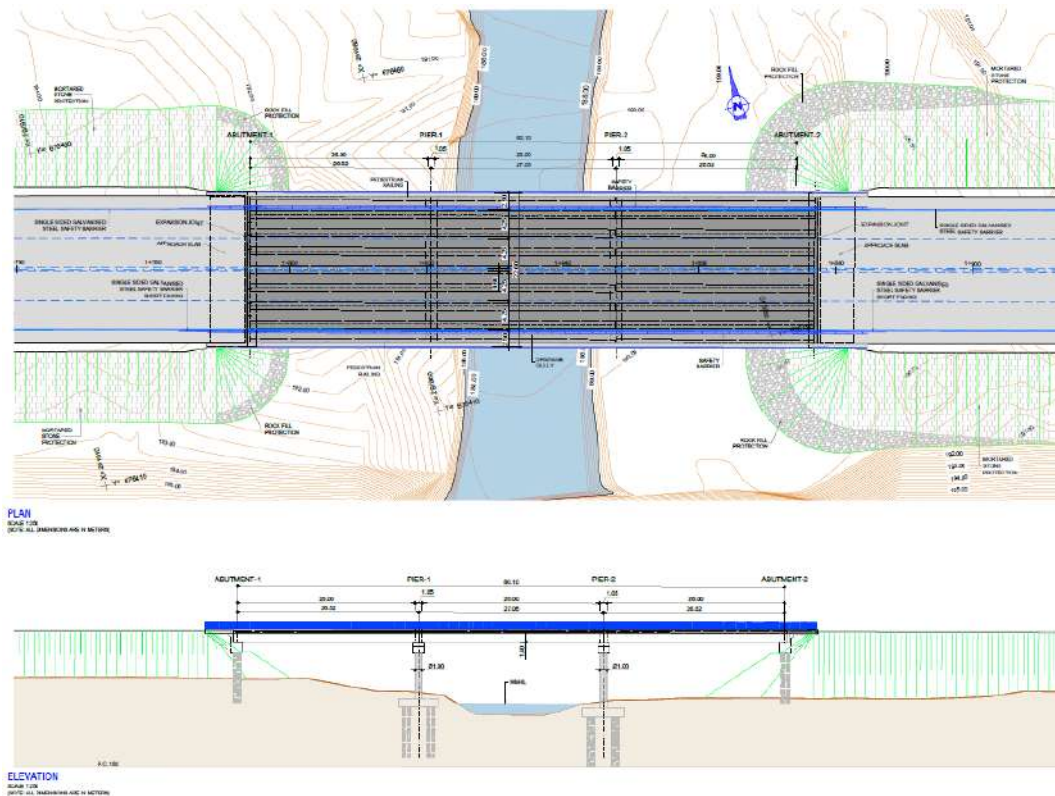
Plan and planned cross-section for the bridges (Source: QG Konstruktion GmbH, 2023).
